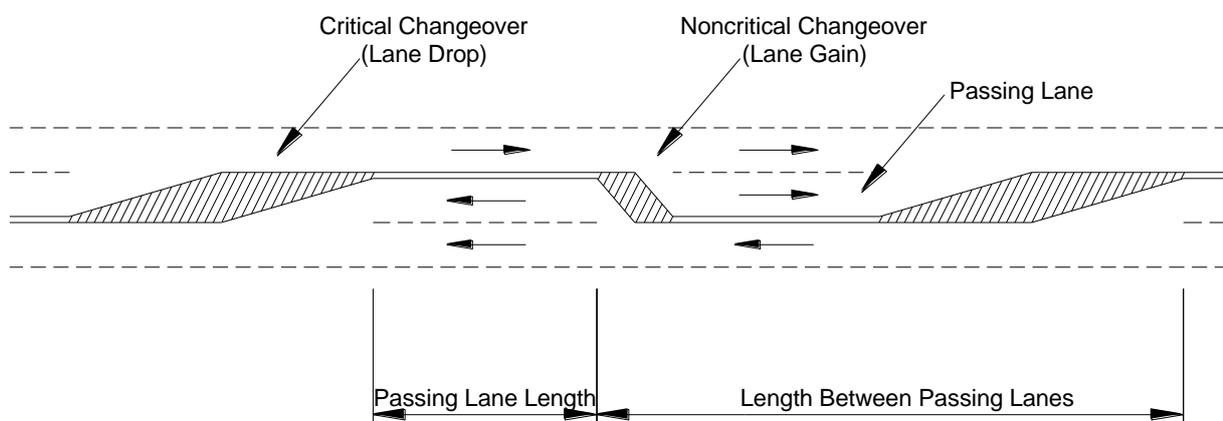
/1: Schematic Layout of a Type 3 Dual Carriageway
